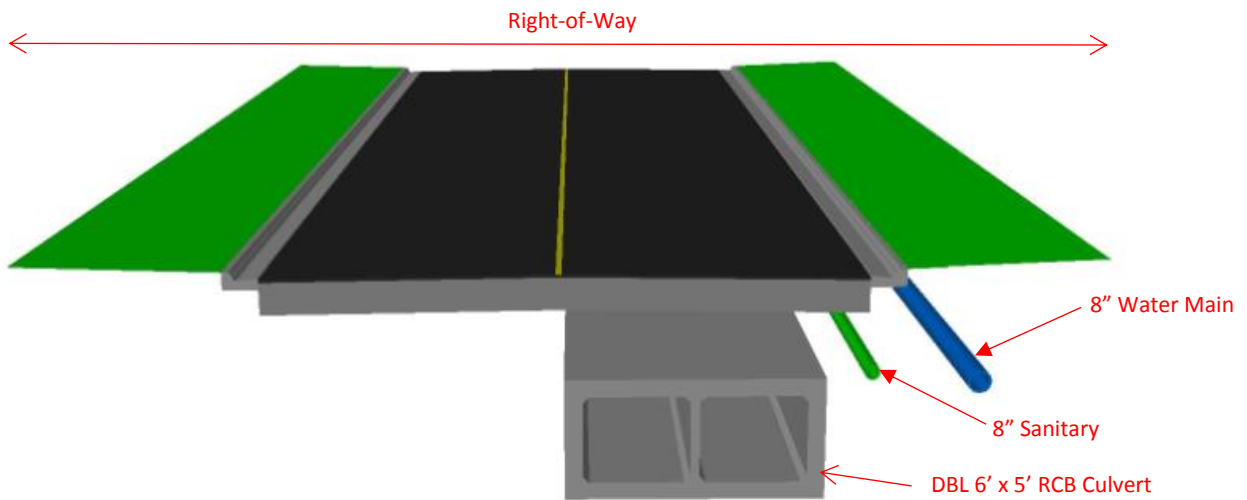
3D Rendering of Rome Avenue south of Gray Street Typical Section (NTS)
